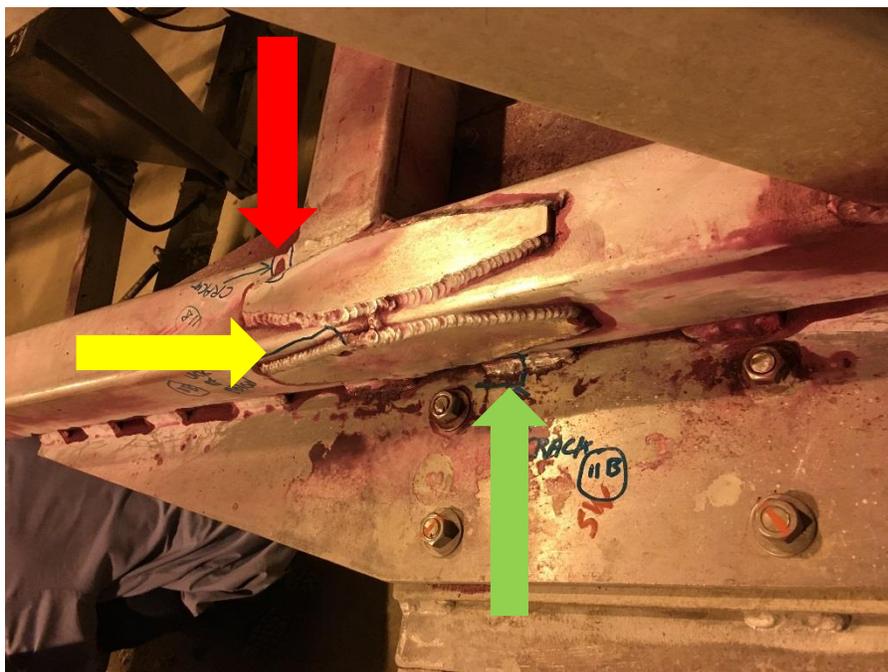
B Red arrow shows location of crack in parent material yellow arrow shows lack of fusion on fish plate weld and green arrow shows crack on stitch weld. All at location 11B
